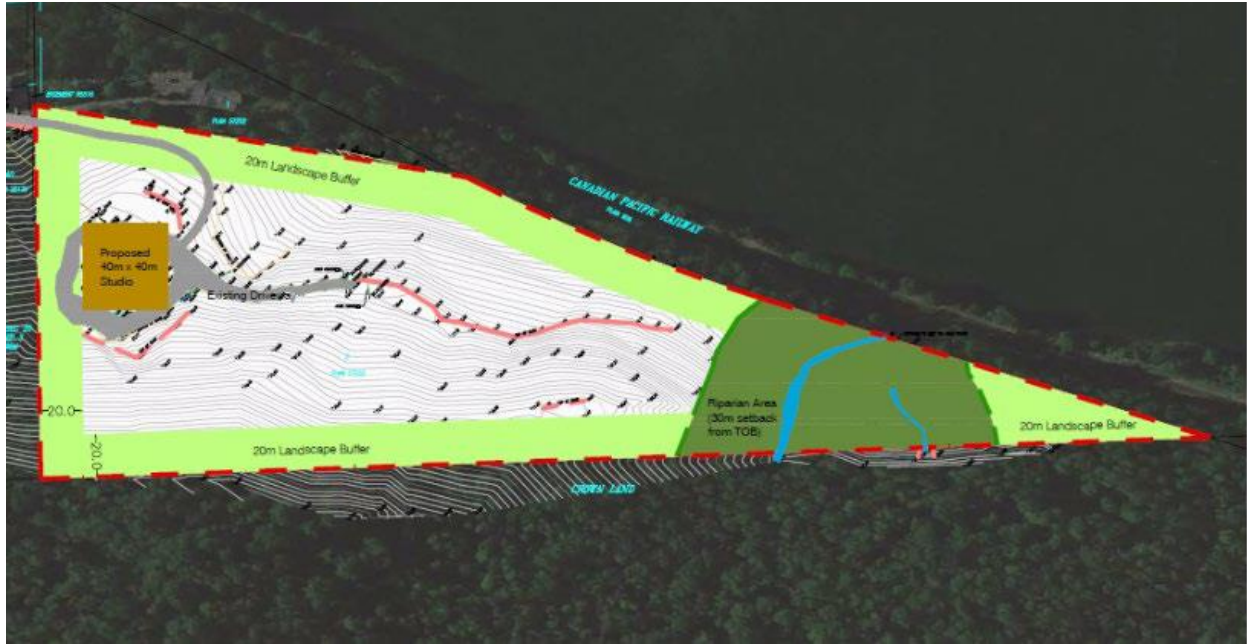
Location of proposed development (red outline) and preliminary site plan.
